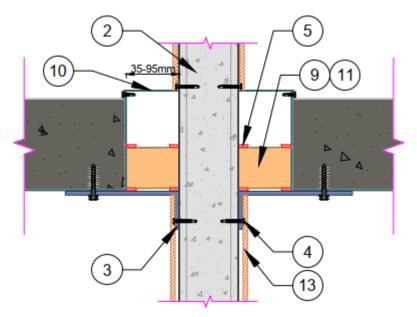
Dual wall system with vertical wall between horizontal walls – gap width of 35-95 mm between the stair and vertically oriented wall
